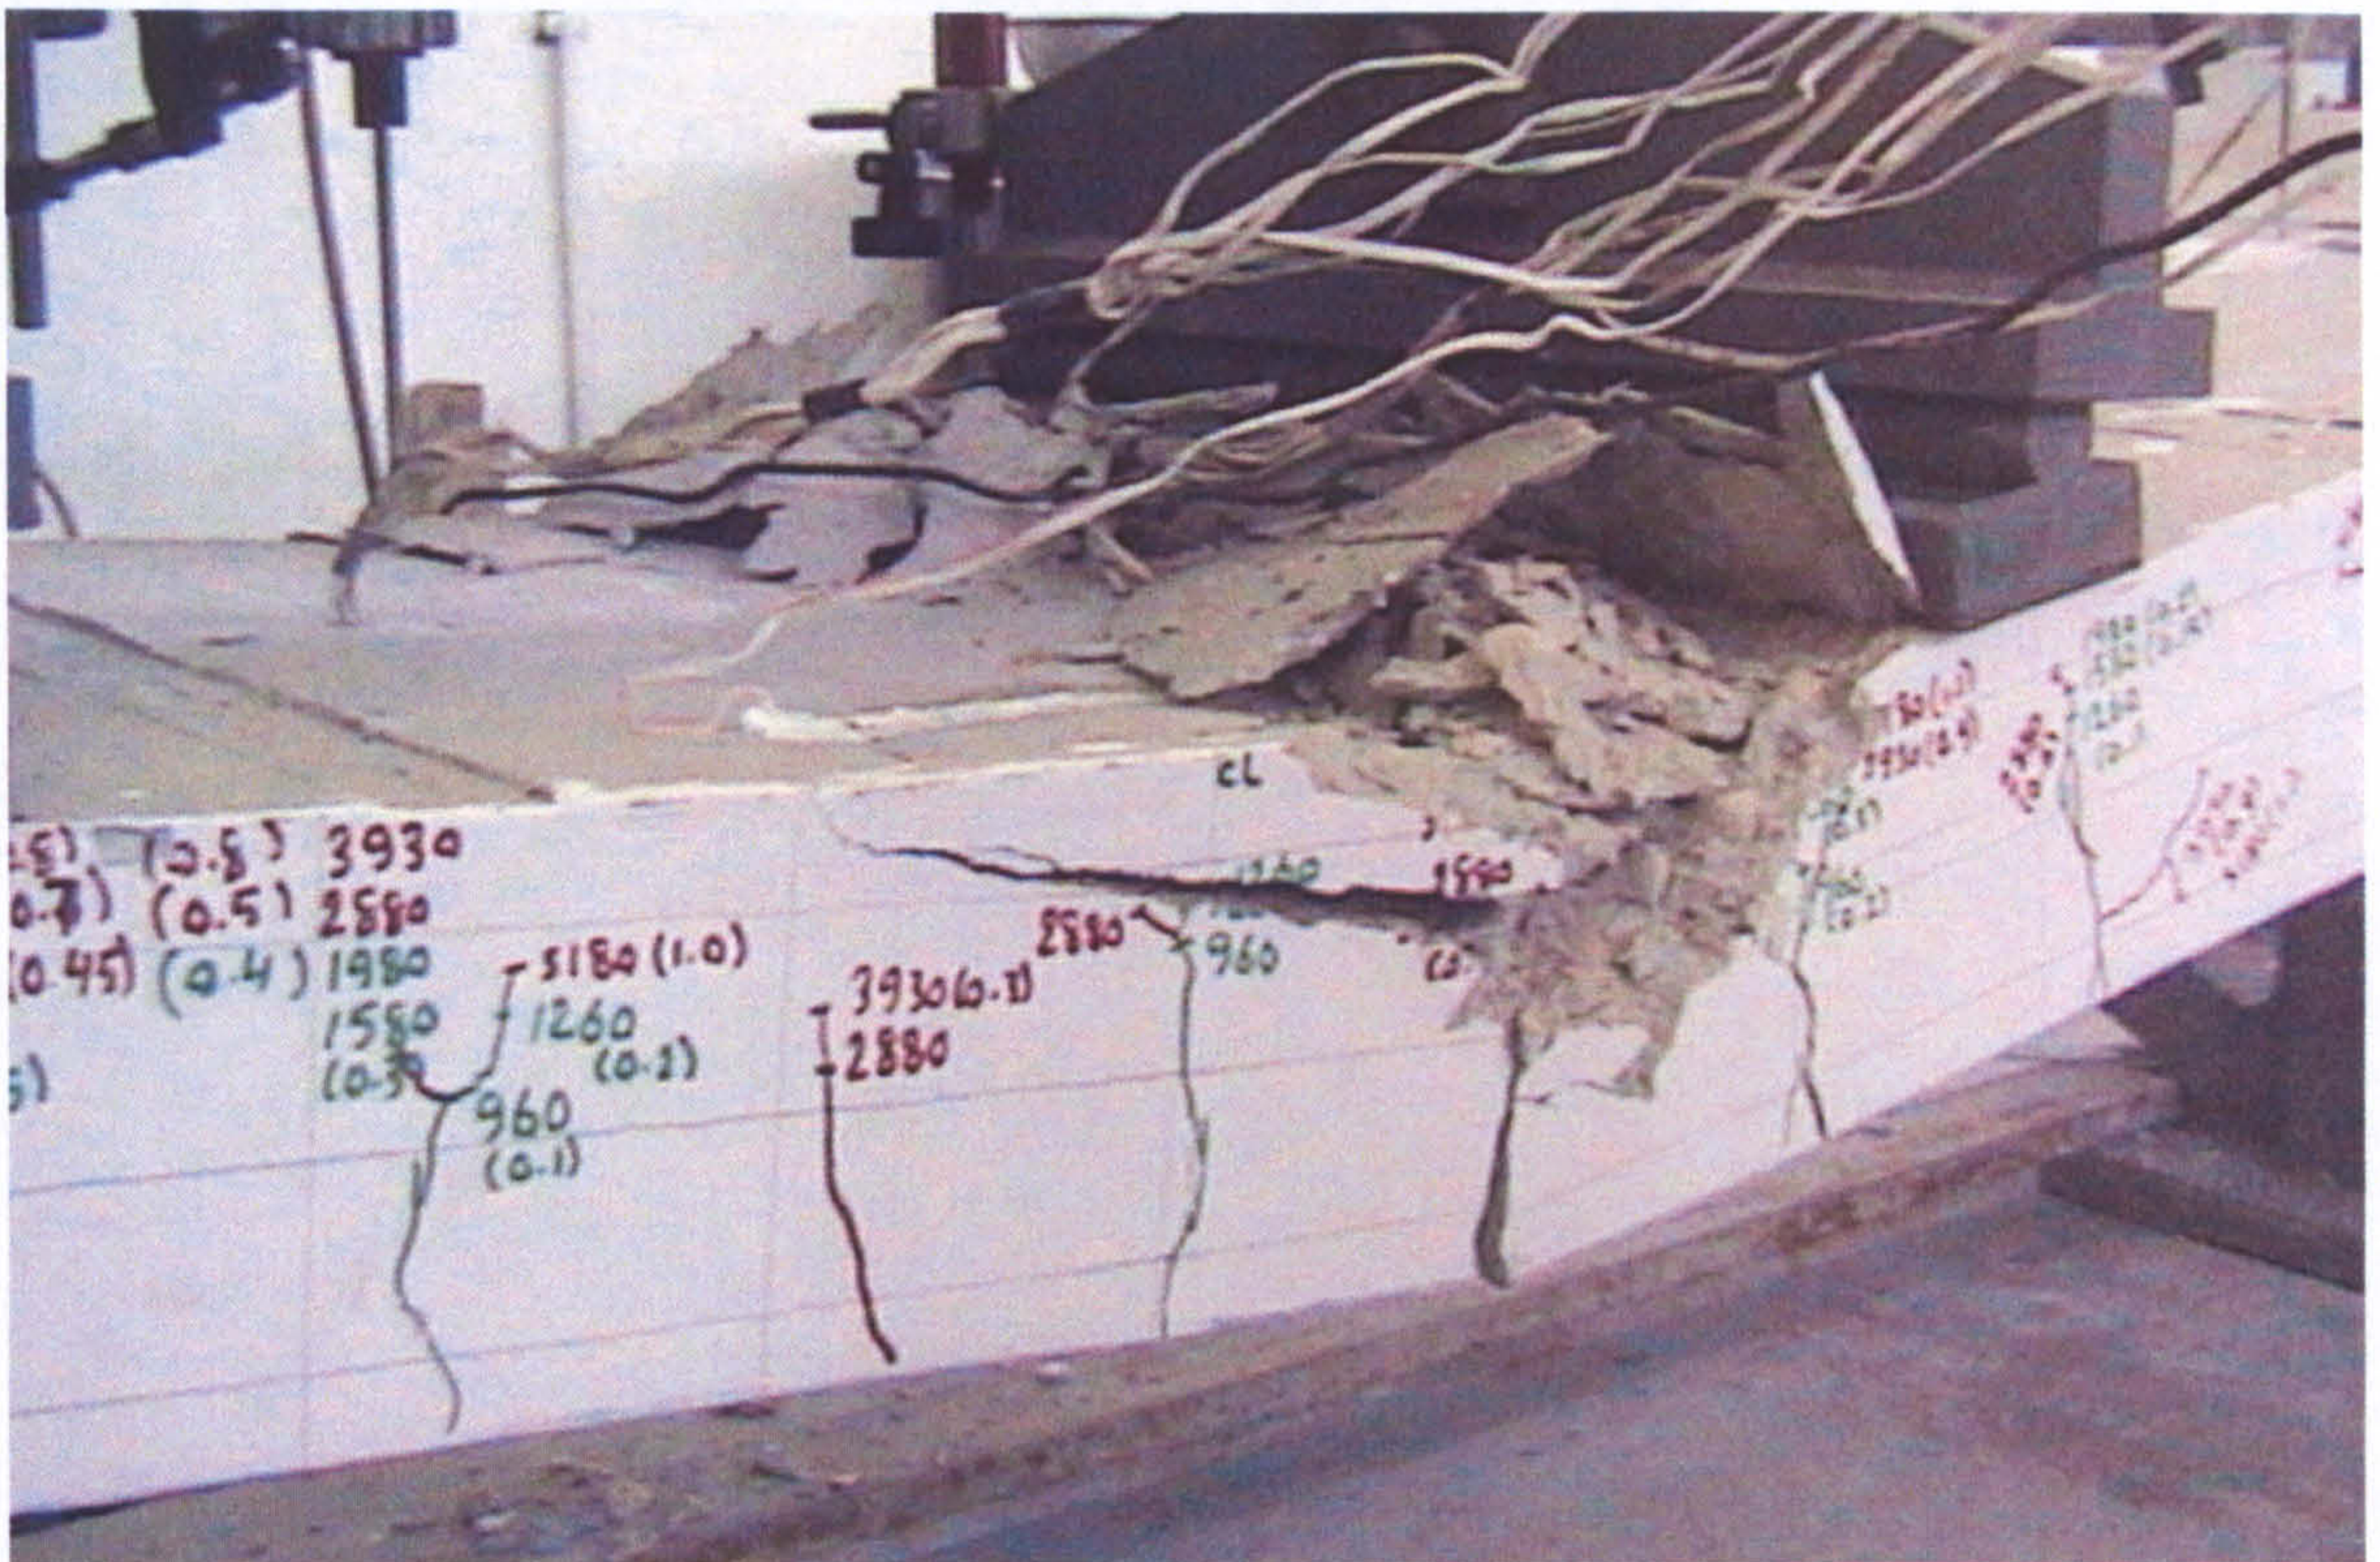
Typical concrete compressive failure (slab SC3a).
